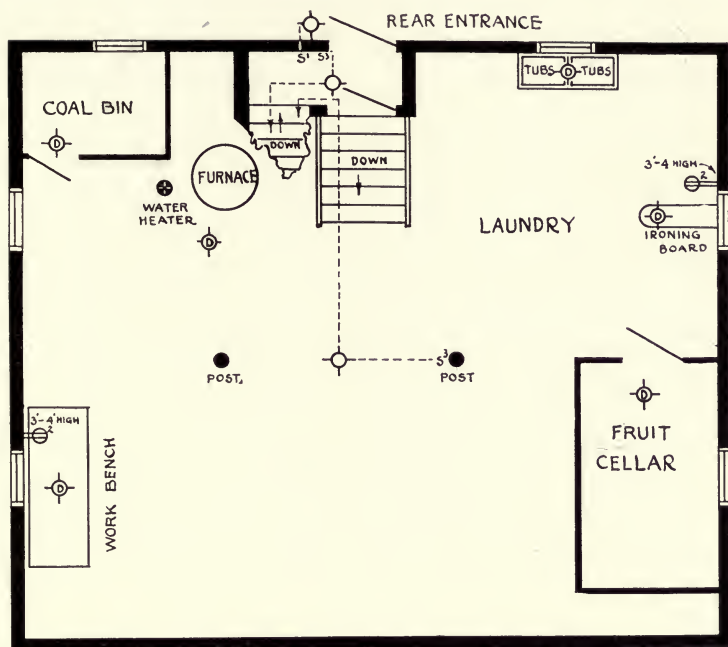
B.—Wiring layout suggested for the procurement of electrical comfort and convenience. Typical basement plan.
